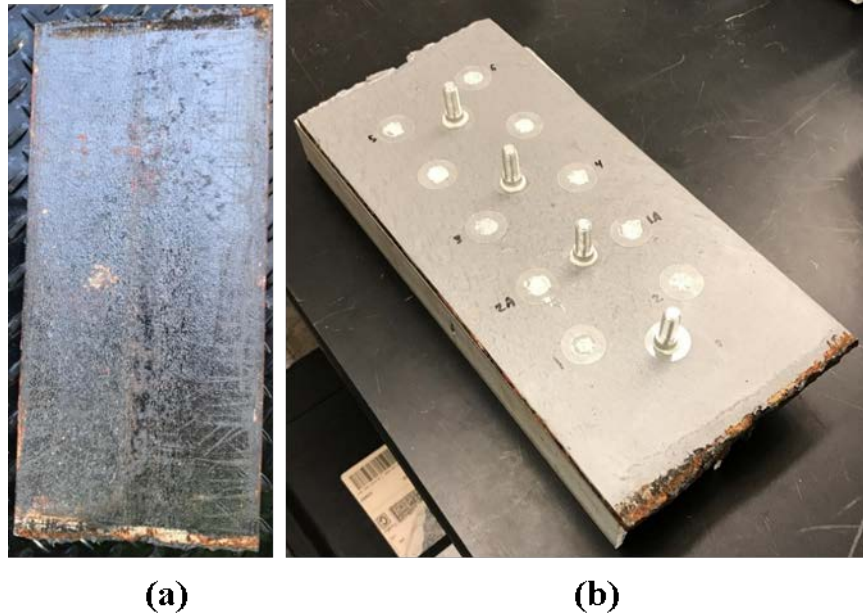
LACR-Cleaned I-Beam Flange: (a) before and (b) after repainting with PATTI stubs. LACR = laser ablation coating removal; PATTI = pneumatic adhesion tensile testing instrument.
